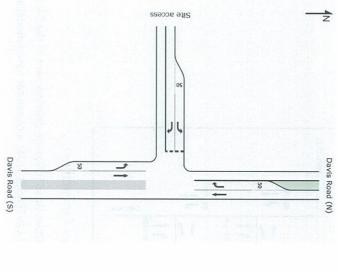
Proposed Post-Development Layout for Access Intersections with Davis Road
